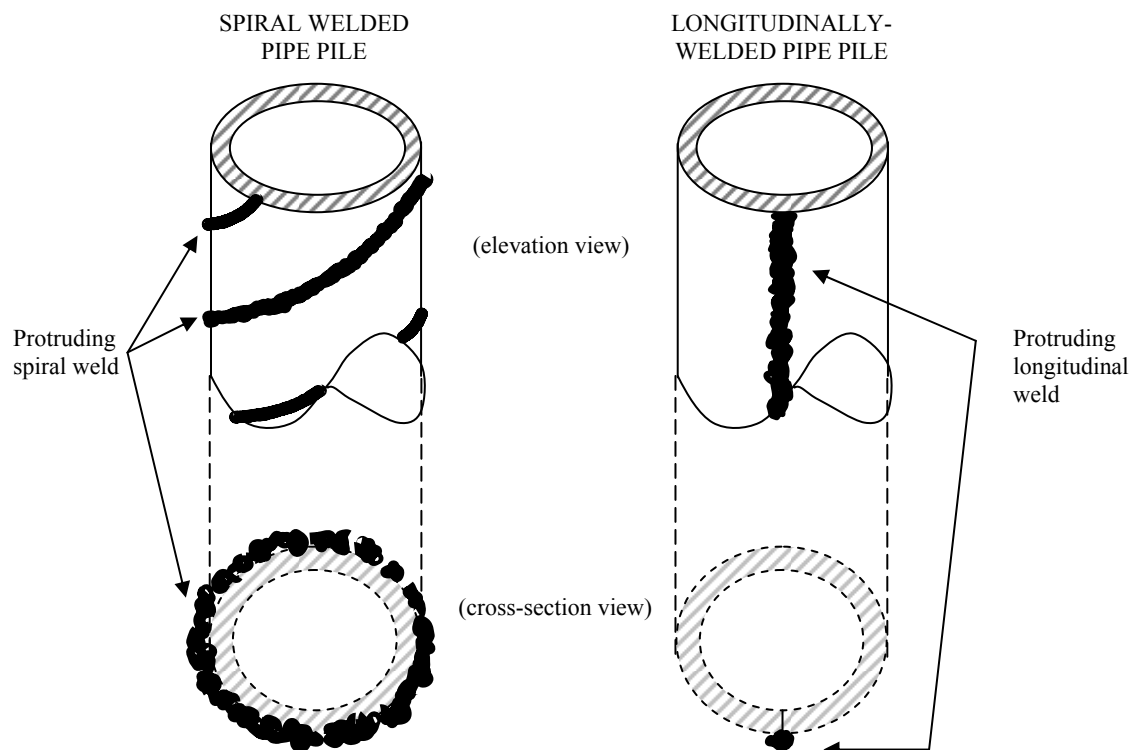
Elevation view and cross-section view of spiral welded pipe pile and longitudinally-welded pipe pile
